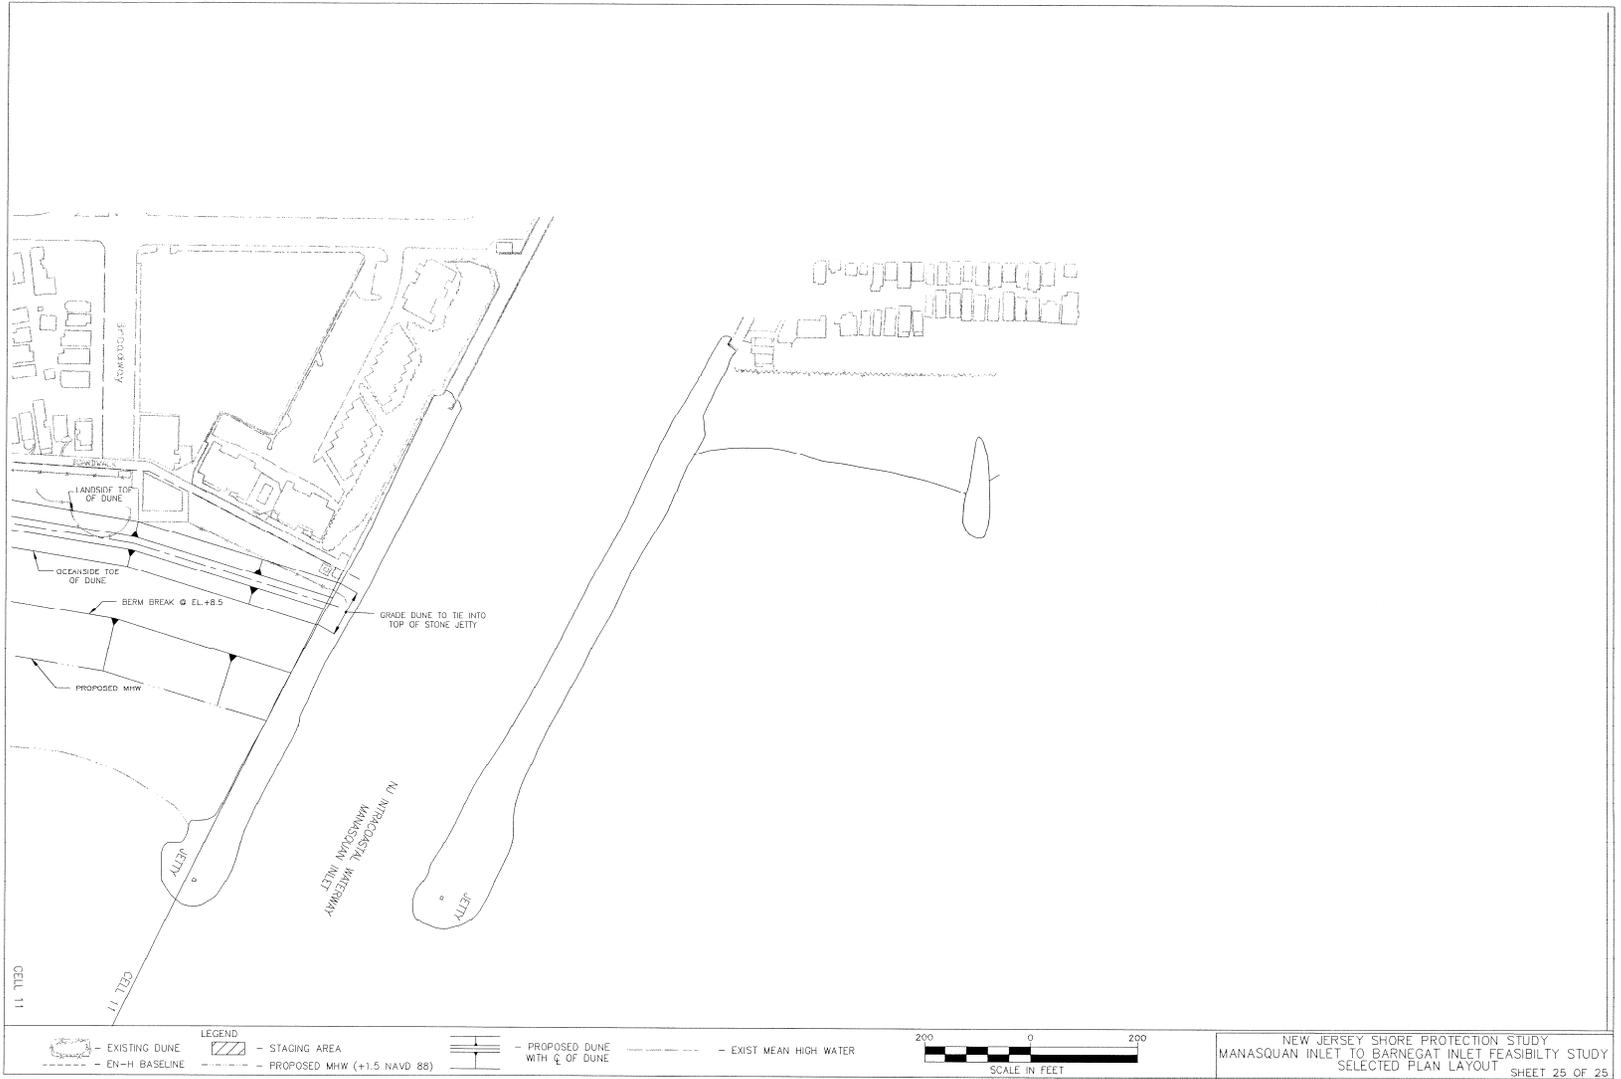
Selected Plan Layout – Point Pleasant Beach Borough at Manasquan Inlet
